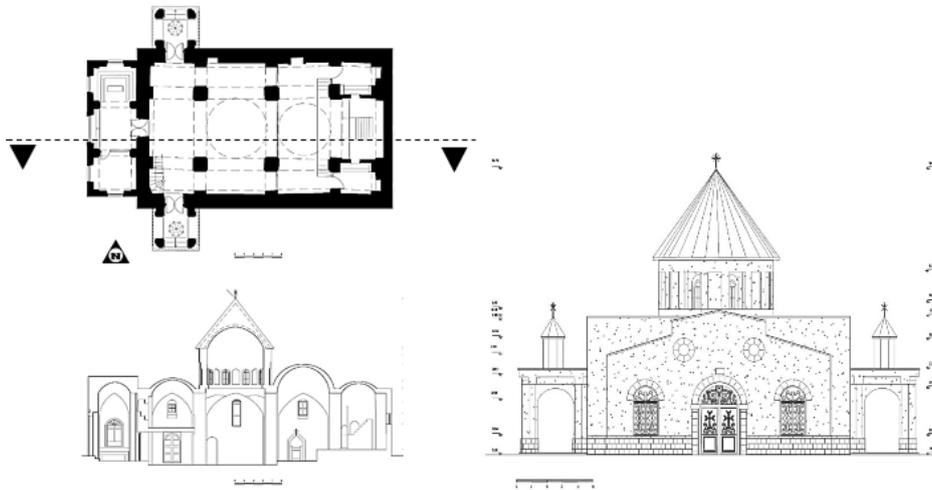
Right - Eastern Façade of St. Sarkis Church, Left - Plan and Cross-Section of St. Sarkis Church (Cultural Heritage Organization of East Azerbaijan Province)
